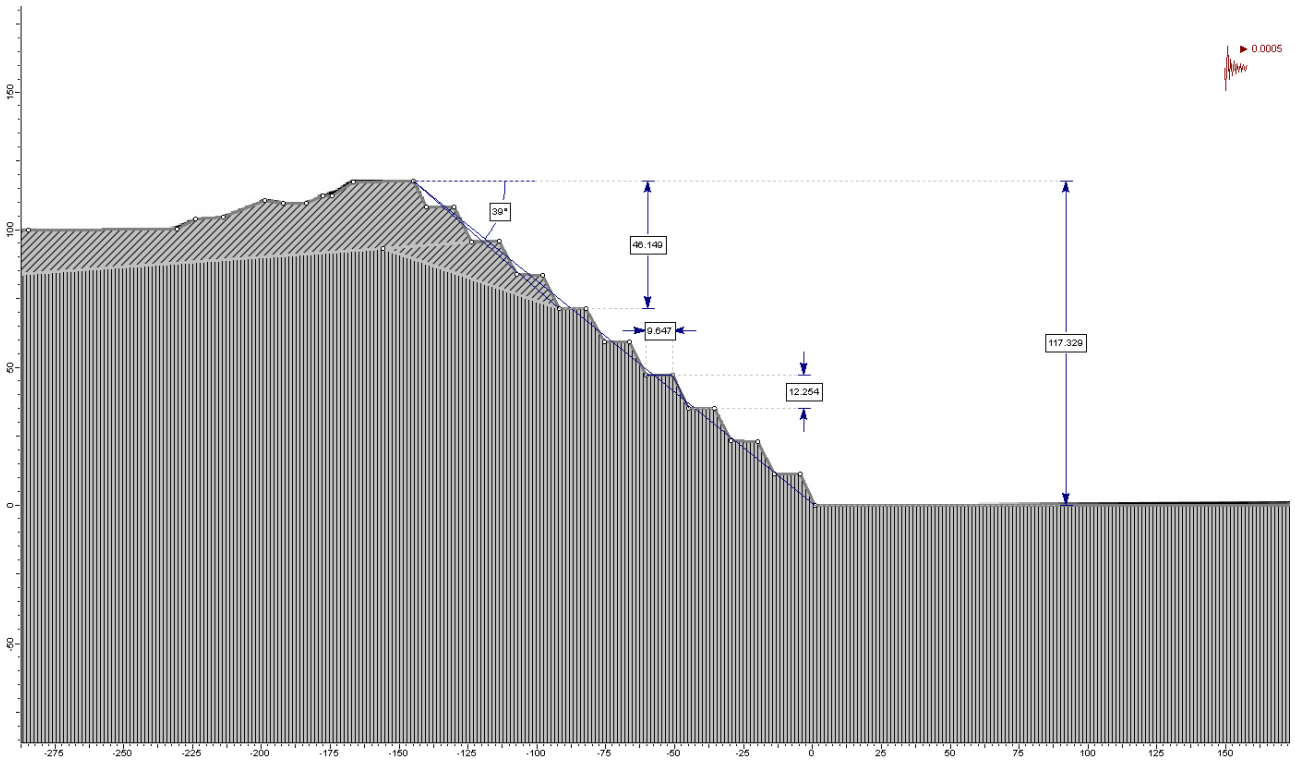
Cross-section through the west wall of Pit 3-4.
